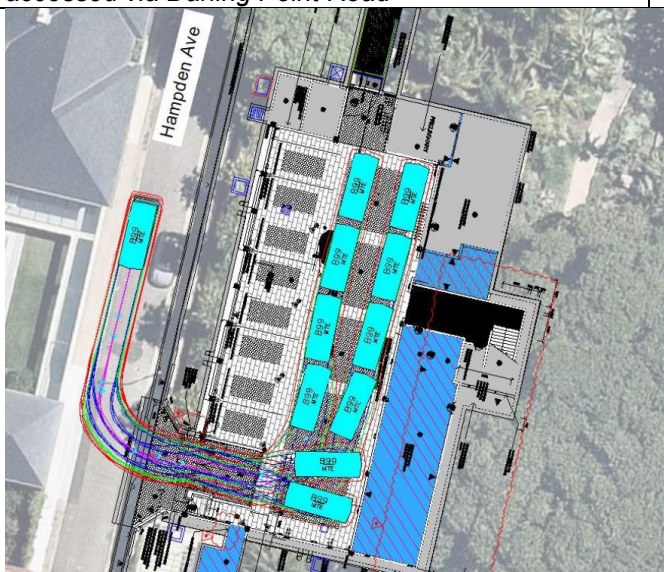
10 car spaces to the basement car park accessed via Hampden Ave.
